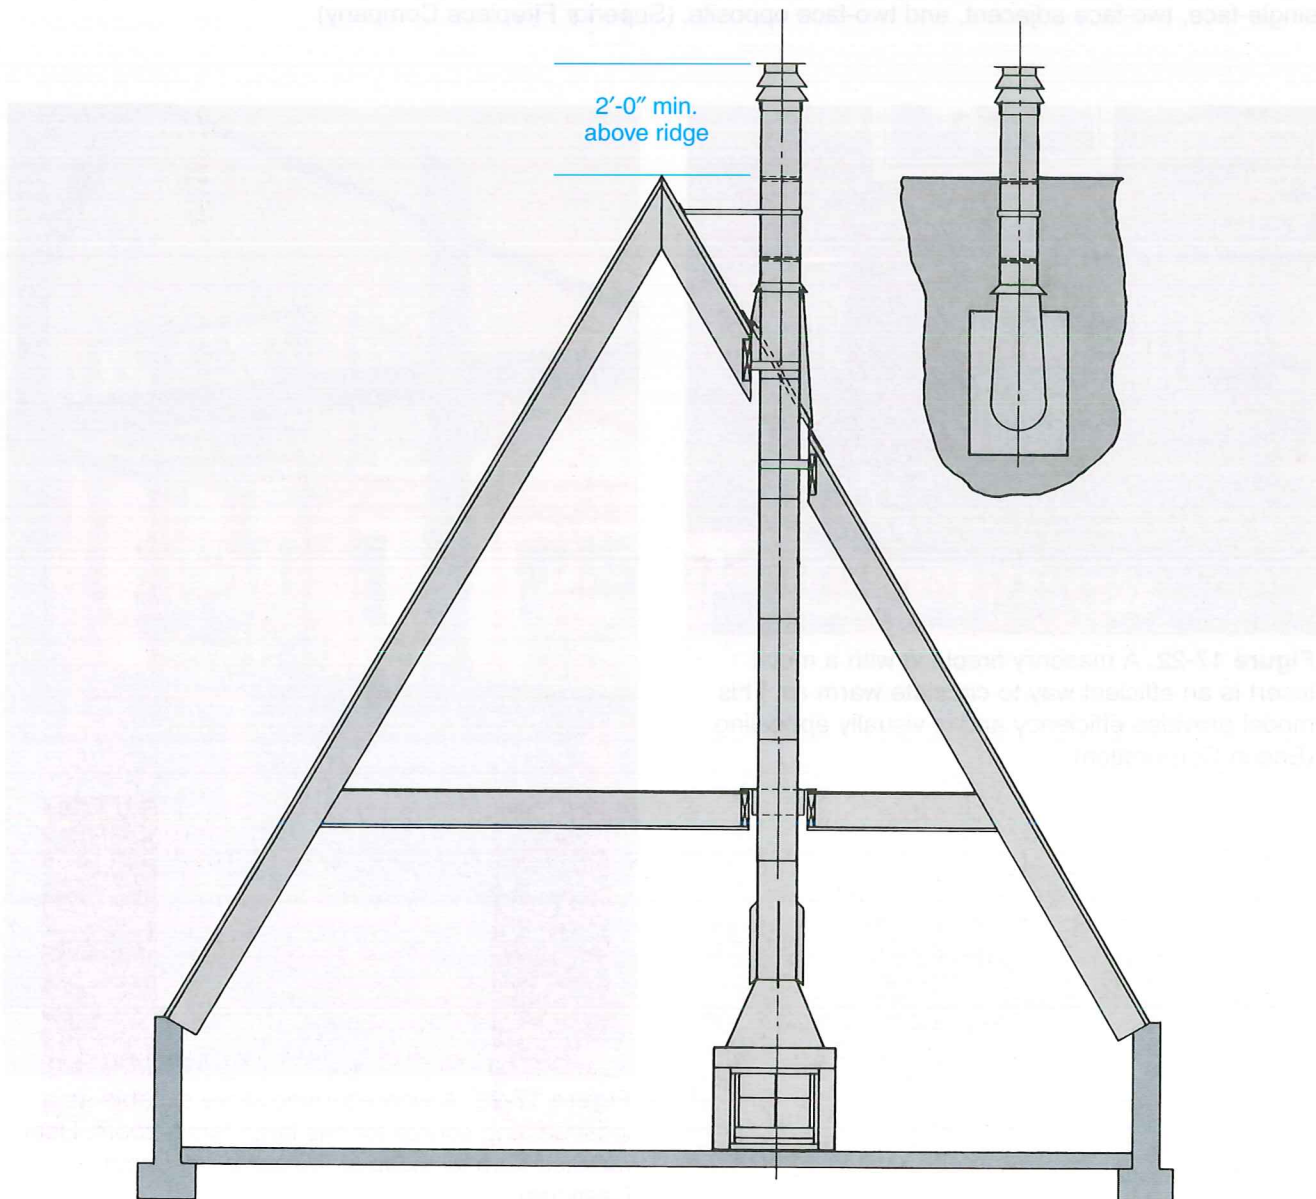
A typical installation of a prefabricated metal fireplace in a cottage.
